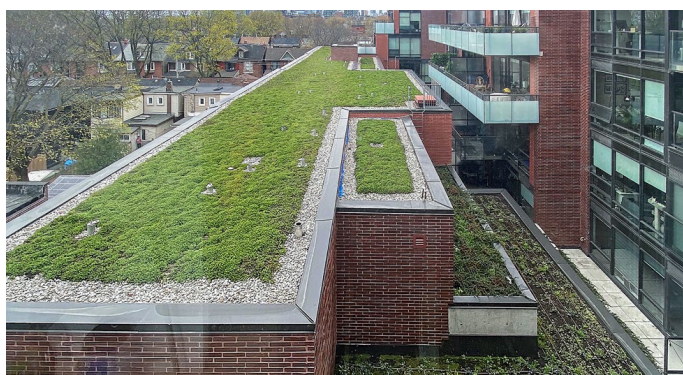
Example of green roof developed on areas of the roof not utilized as a mechanical penthouse.
